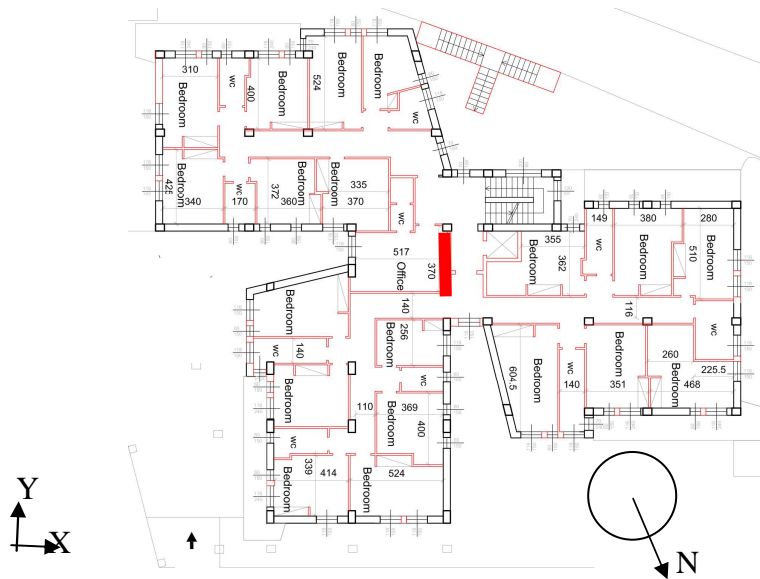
Plan of the typical building floor after refurbishment in 2000. The thick line marks the position of a fire resistant wall on Beam 18-29 which triggered the collapse of this beam at several levels.
